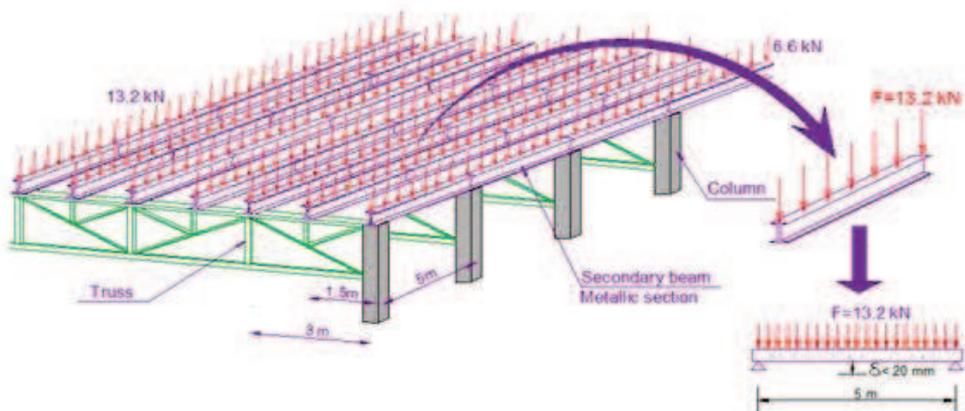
Schema of the roof metallic construction and the secondary beam separation
